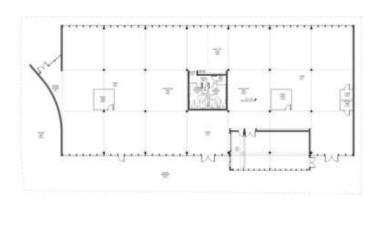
Plate XLIV: Lower ground floor and ground floor plan of UMEA School of Architecture.
